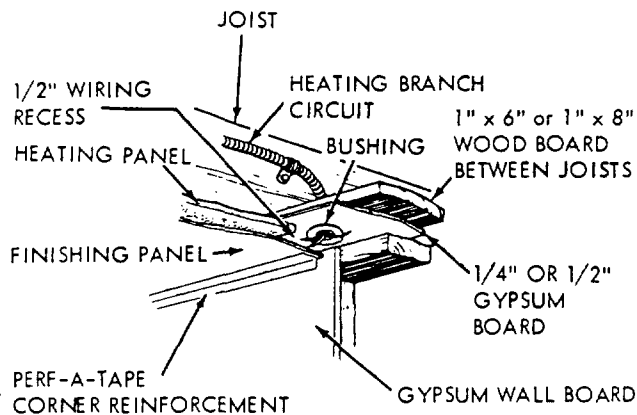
Wiring Recess Construction (1/2" Depth)
